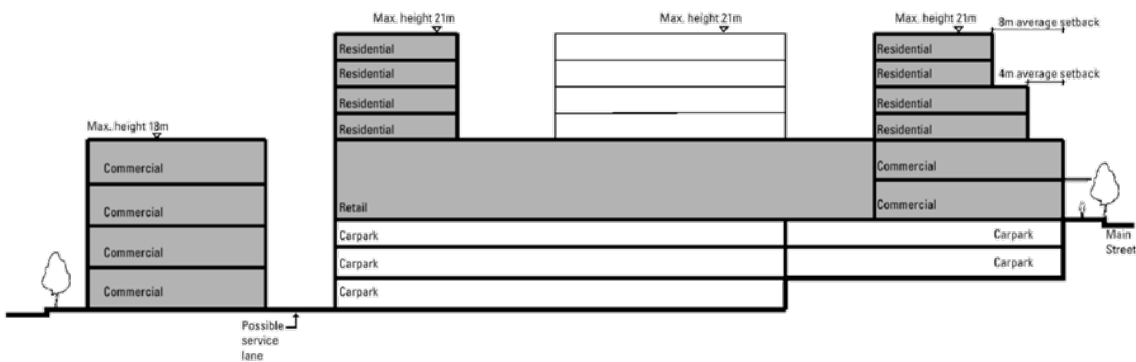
SECTION THROUGH RETAIL CENTRE (FROM TYPE 6 TO TYPE 4 STREETS)
